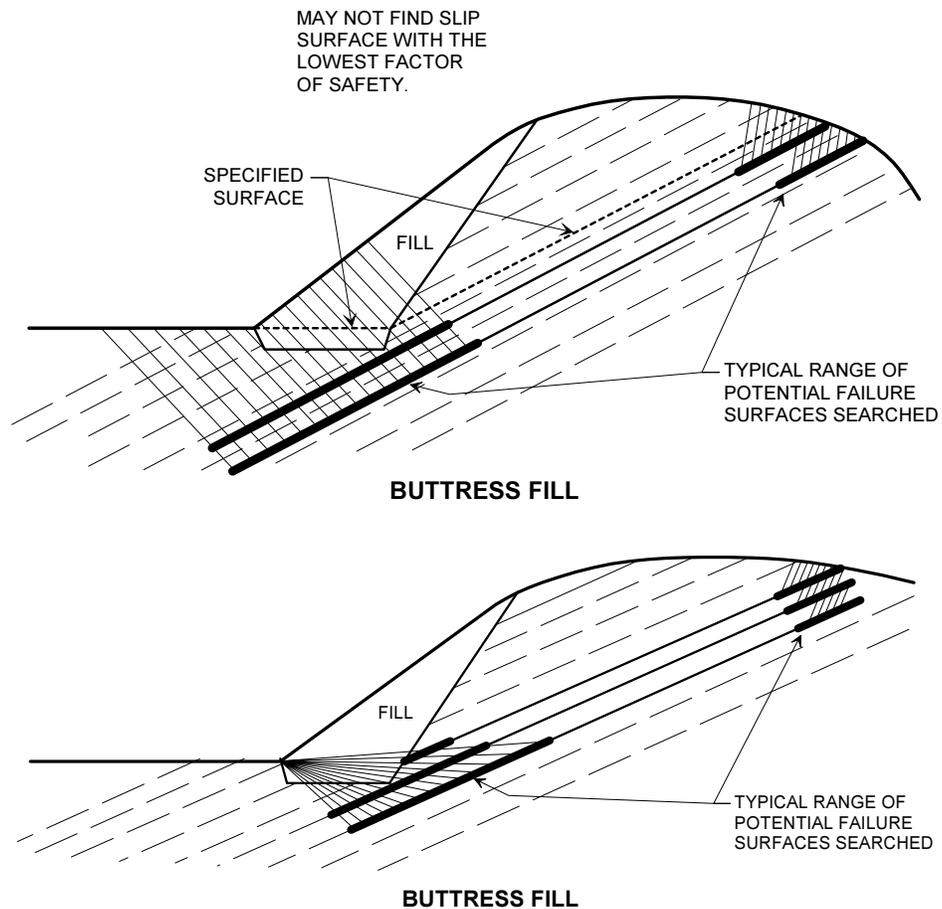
Example of Use of Specified Failure Surface Geometry for Existing Landslide
